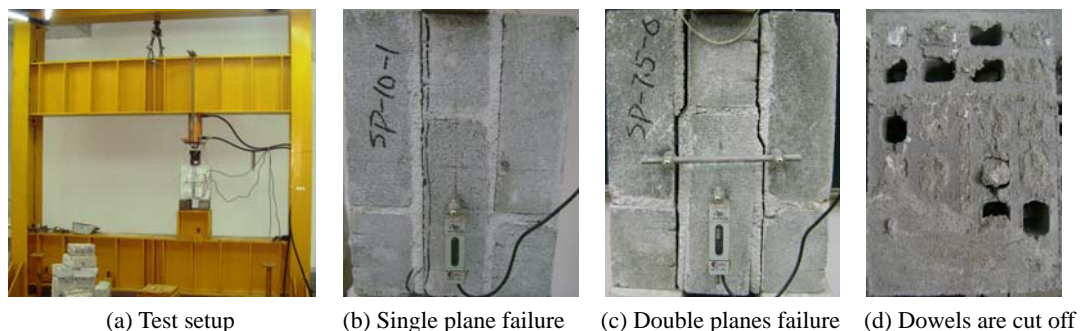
Test setup and shear failure mode of concrete perforated brick masonry
